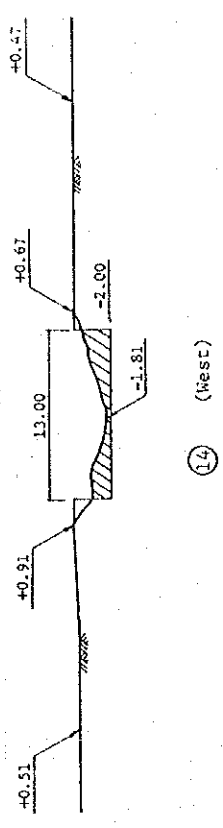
CROSS SECTION OF DRAIN (BANG KHEN, BANG SUE DRAINAGE AREA)
